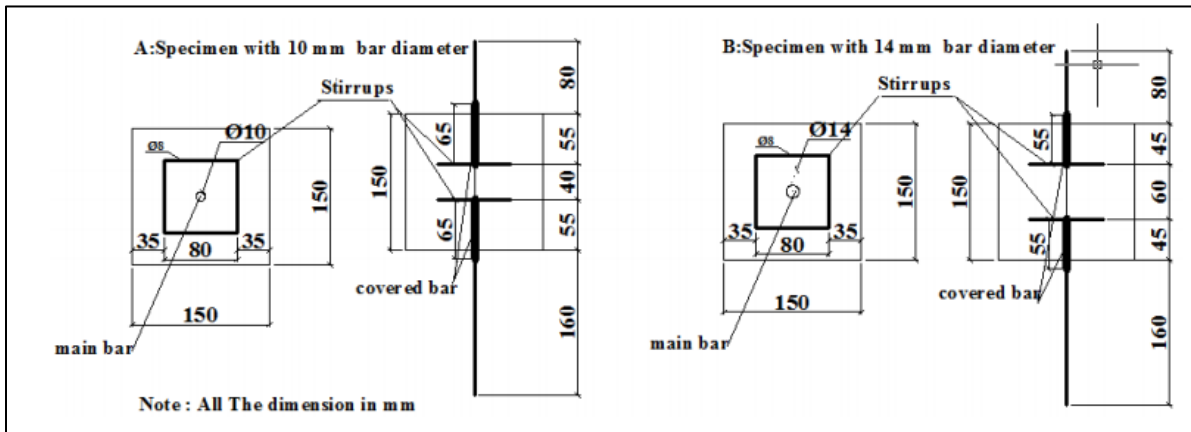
Pullout Specimen Details (Source: Mansoor and Zhang, 2013)
